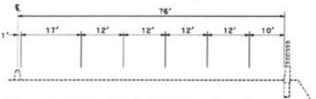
Existing I-10 Half-Width Section with Soundwalls
